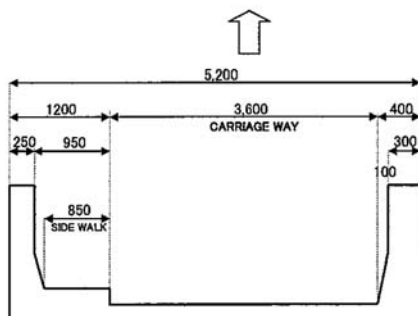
Typical cross section of one-lane bridge (Agreed at the previous meeting for signing technical memorandum on 19th Apr, 2011)
